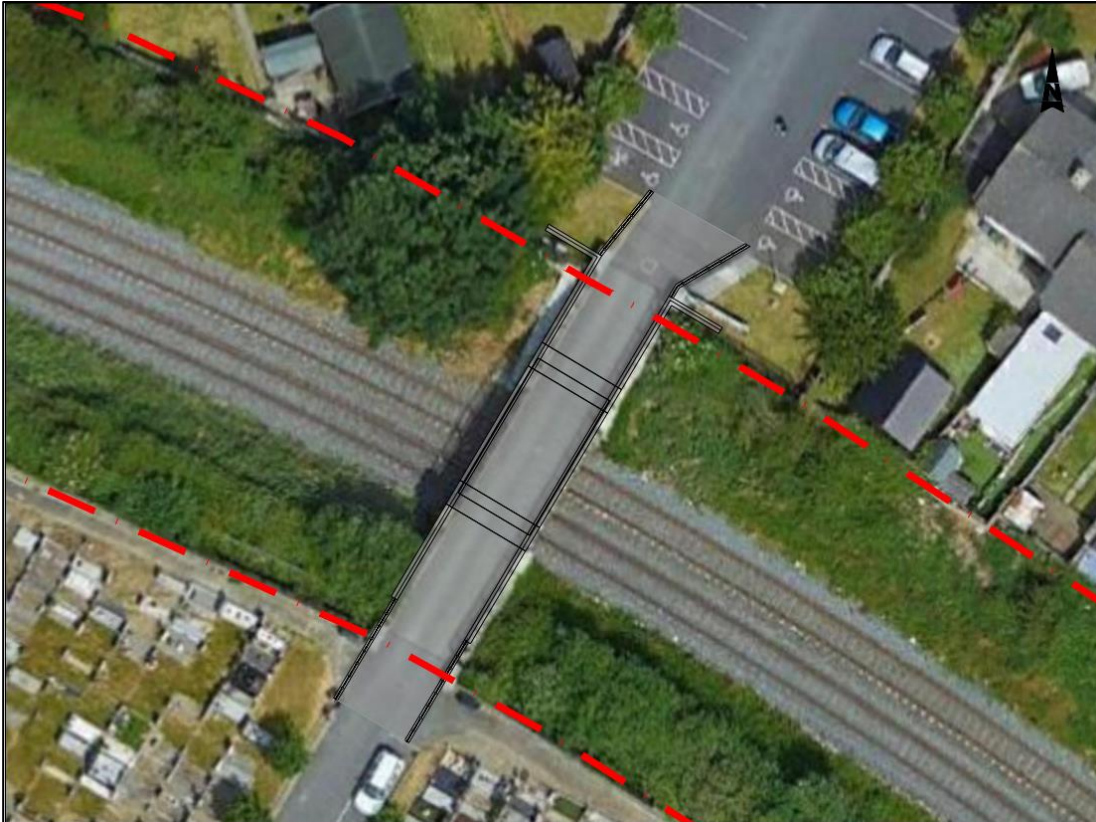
Existing layout of Glasnevin Cemetery Road Bridge
